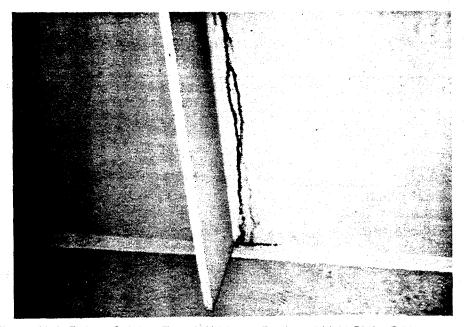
Fatigue Crack at Toe of Weld on a Fabricated Multi-Girder Bridge
